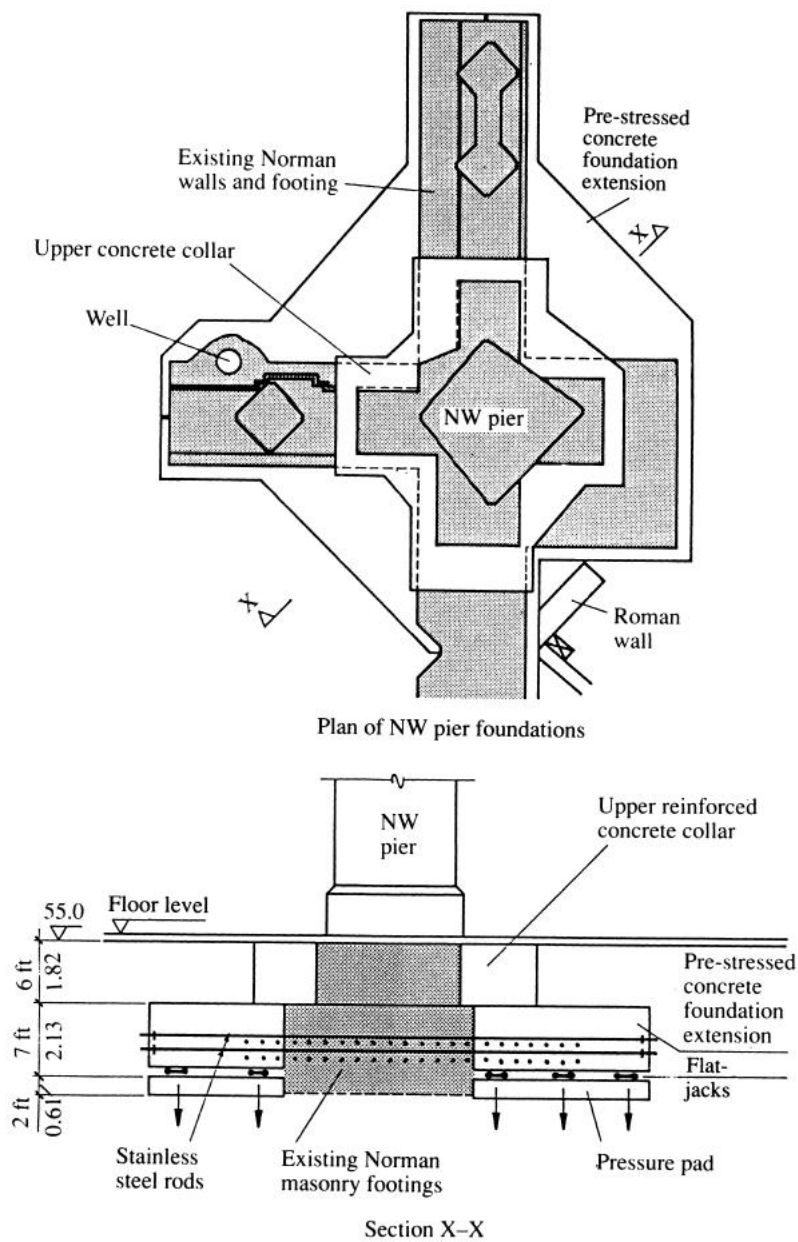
Central Tower Foundation, York Minster, England (Vourtesy of Ove Arup & Partners)
